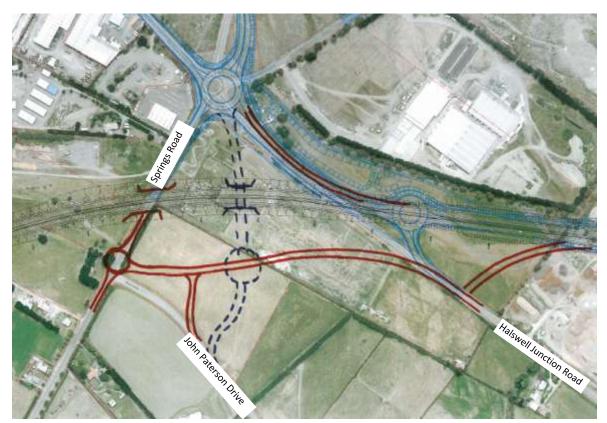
Sketch of alternative layout at Springs Road/ Halswell - main alignment elevated
